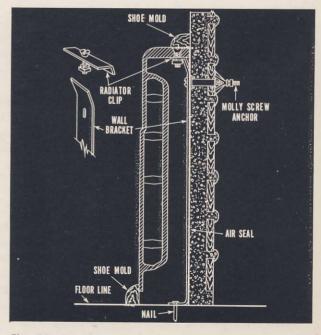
Installation details for type R Radiant Baseboard Panels.
